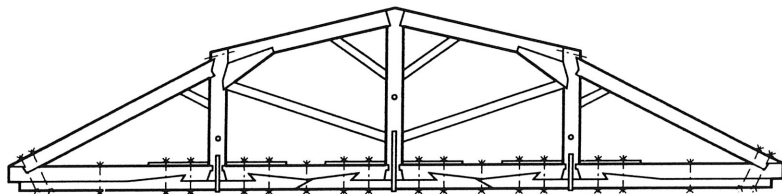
Development of timber roof construction: Wren's Sheldonian theatre roof.
